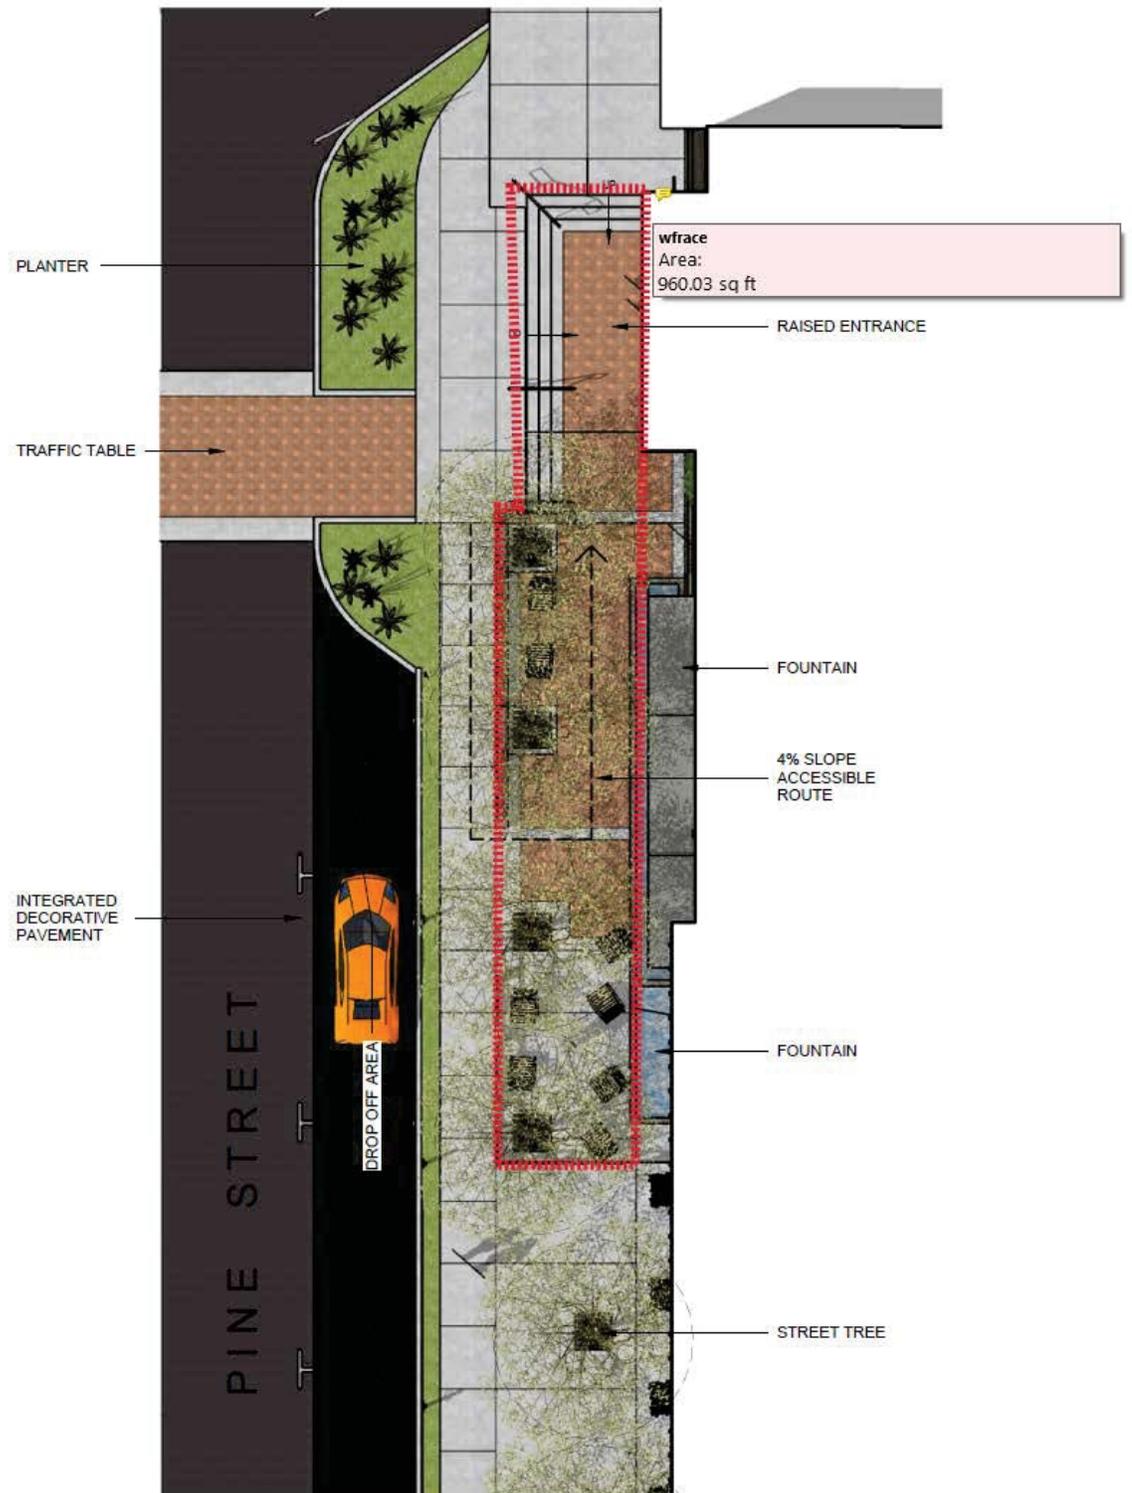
Stairs, Accessible Ramp, and Raised Patio Encroachment Area – 1,000 sq. ft.
